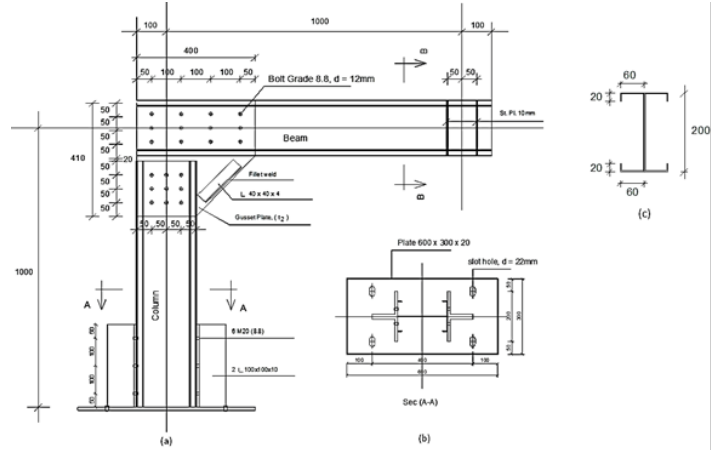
(a) Schematic drawing for beam-to-column connection (S2, S2') (b) base plate detail (c) CFS section dimensions
